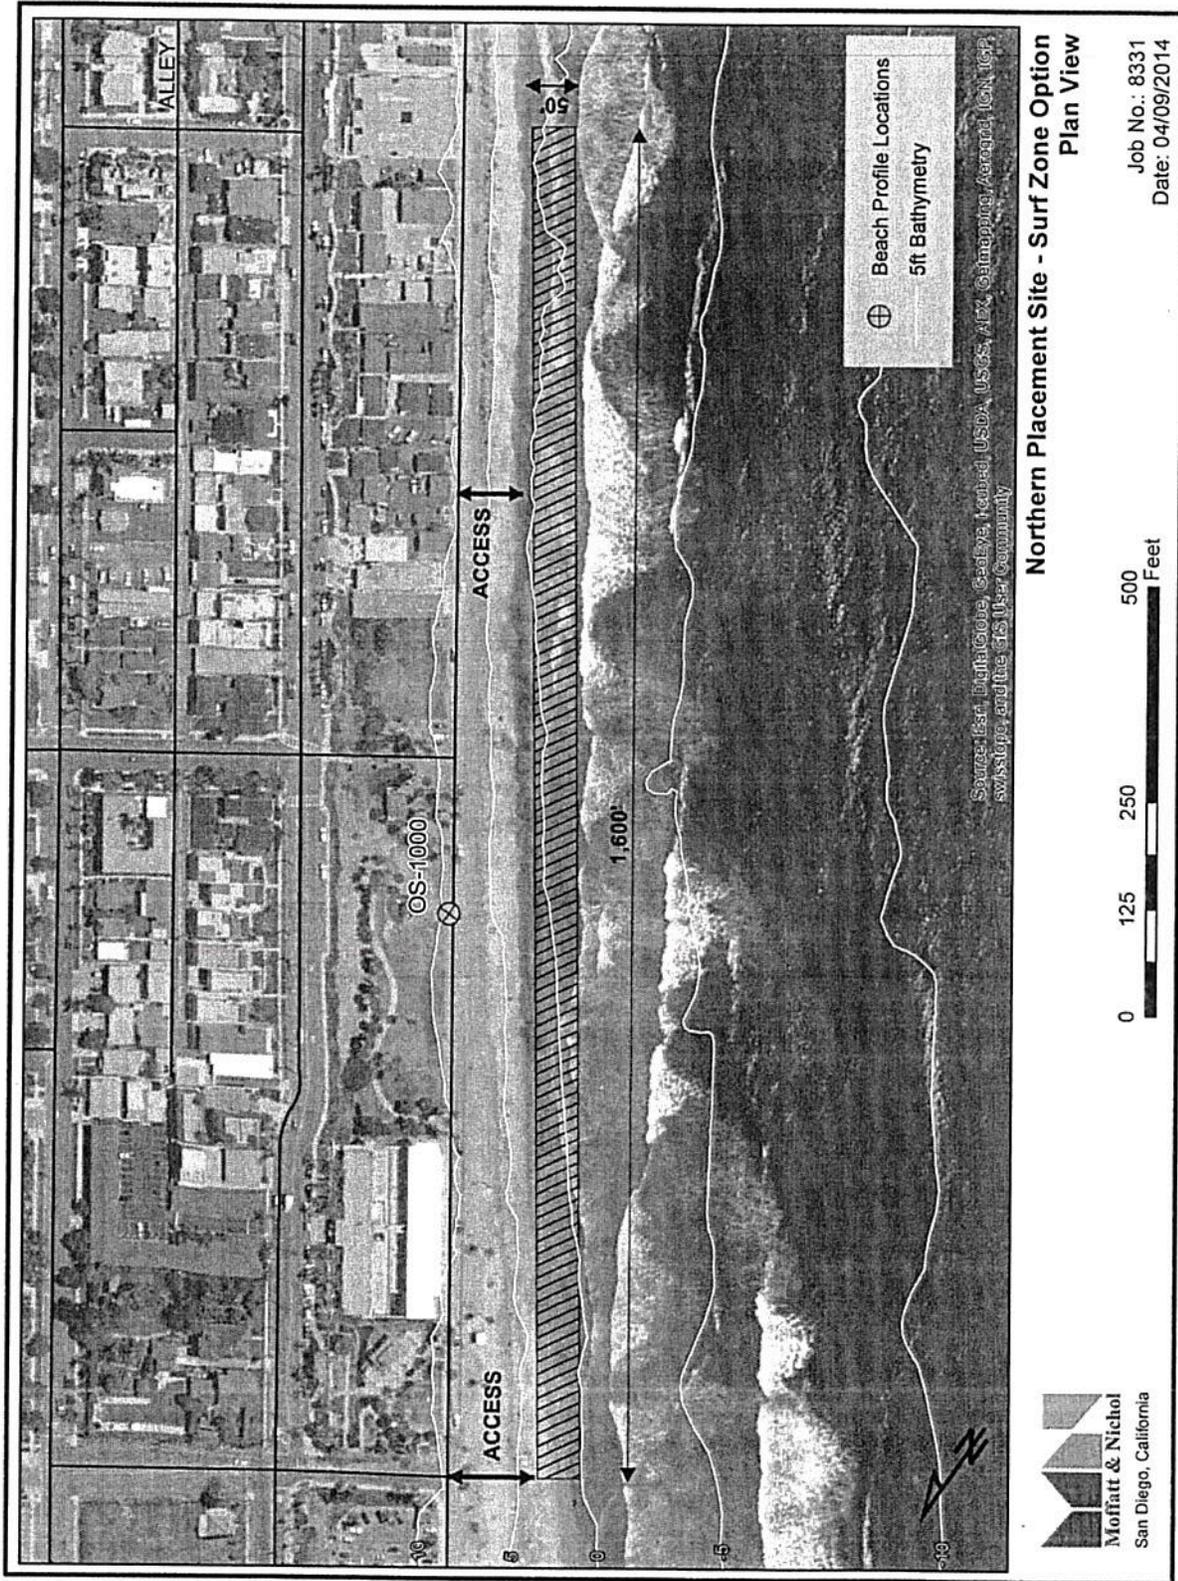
Northern Placement Site Surfzone Placement Option - Plan View
